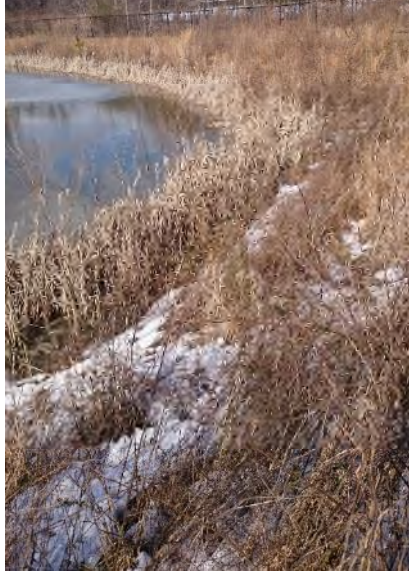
Hopewell High School Stormwater Management Facility: Alternate view of the outfall to the pond.
